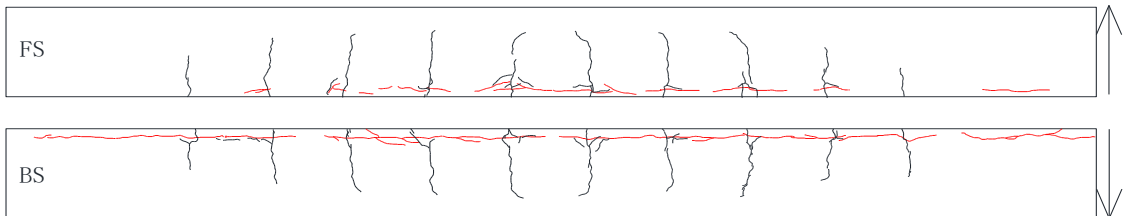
Cracking situation on C3 beam at 29 months
